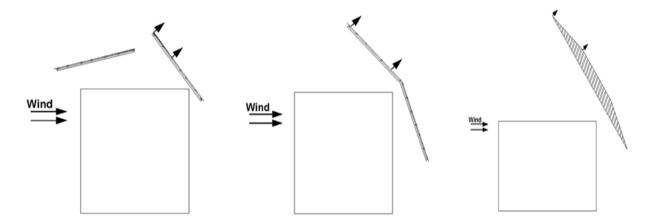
Roof failure at roof ridge and over turning failure mode
